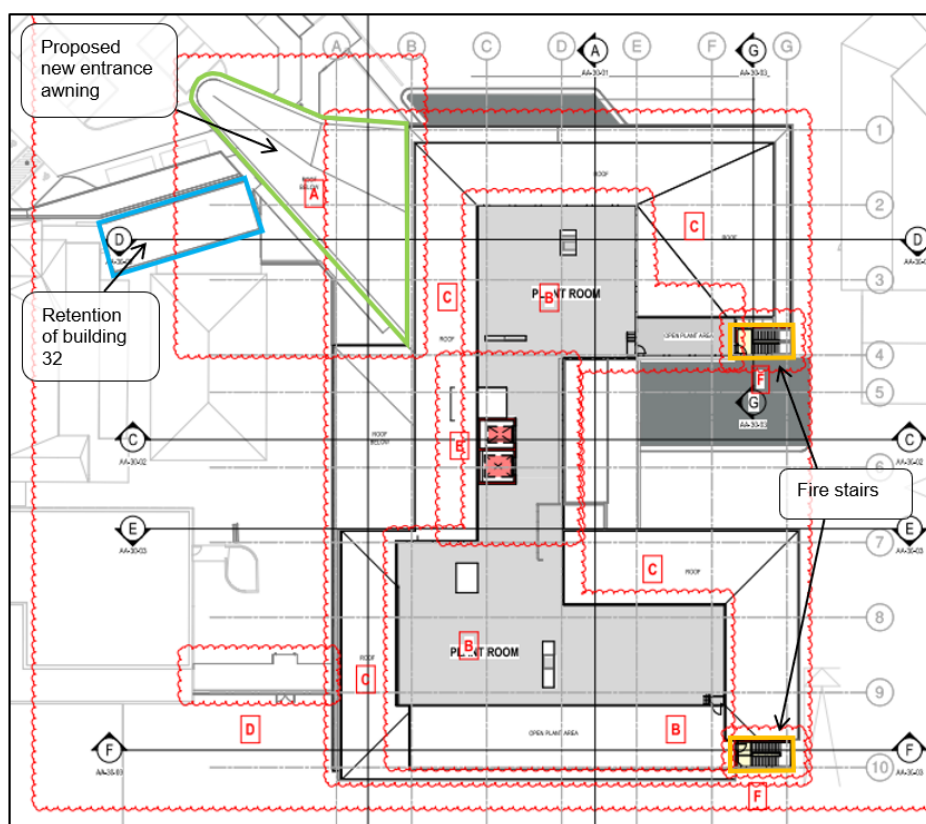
| Proposed level 3 plan (Source: Modification 2 Application)
